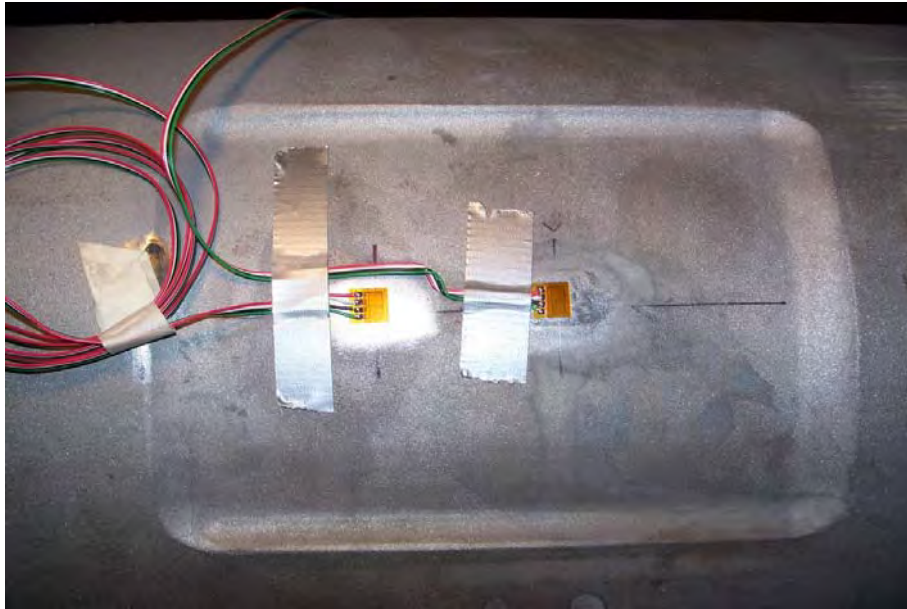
Photograph showing strain gaged in machined region of corrosion sample
